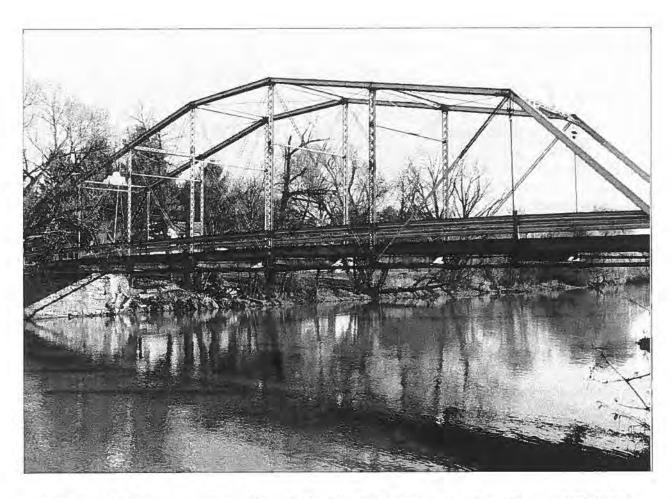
The Manchester Street Brige (P-56-703) in its current location. (Source: WisDOT).
